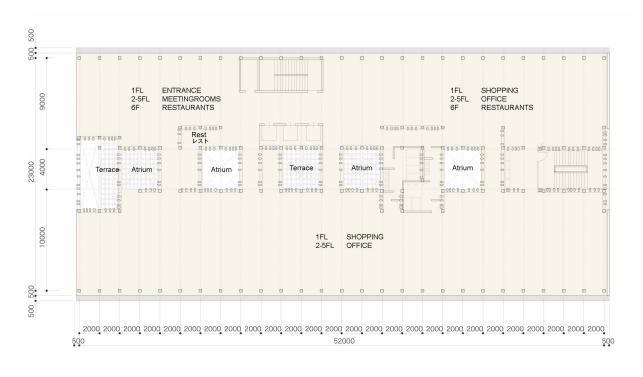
b - Floor plan; Dimensions in [mm]
